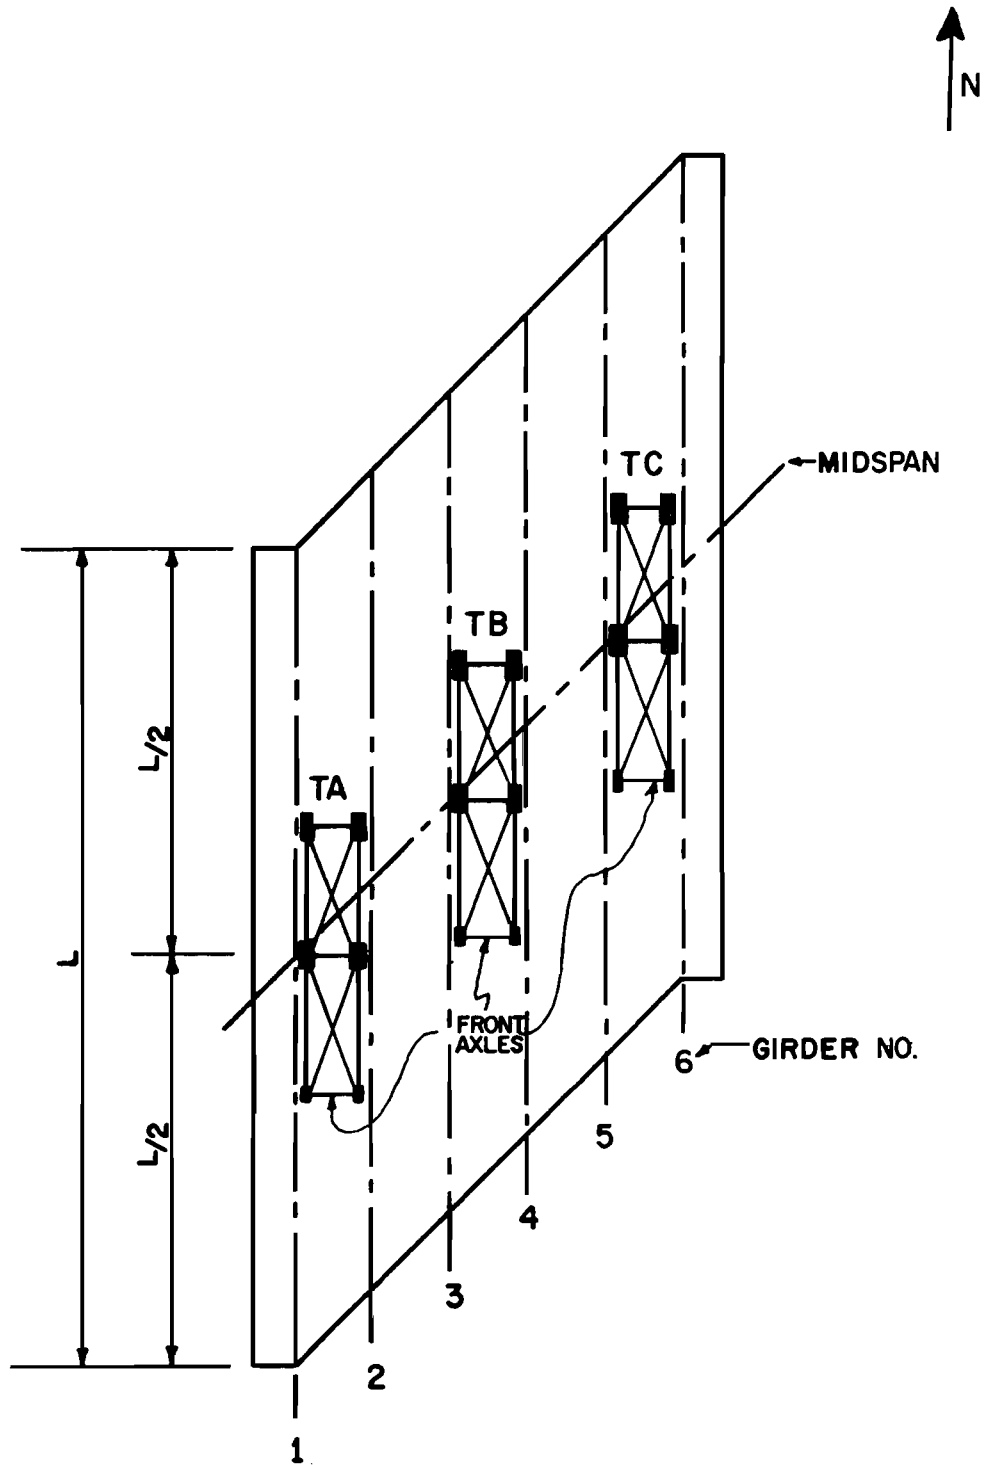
Truck load locations, Bridge 1 and Bridge 2.
